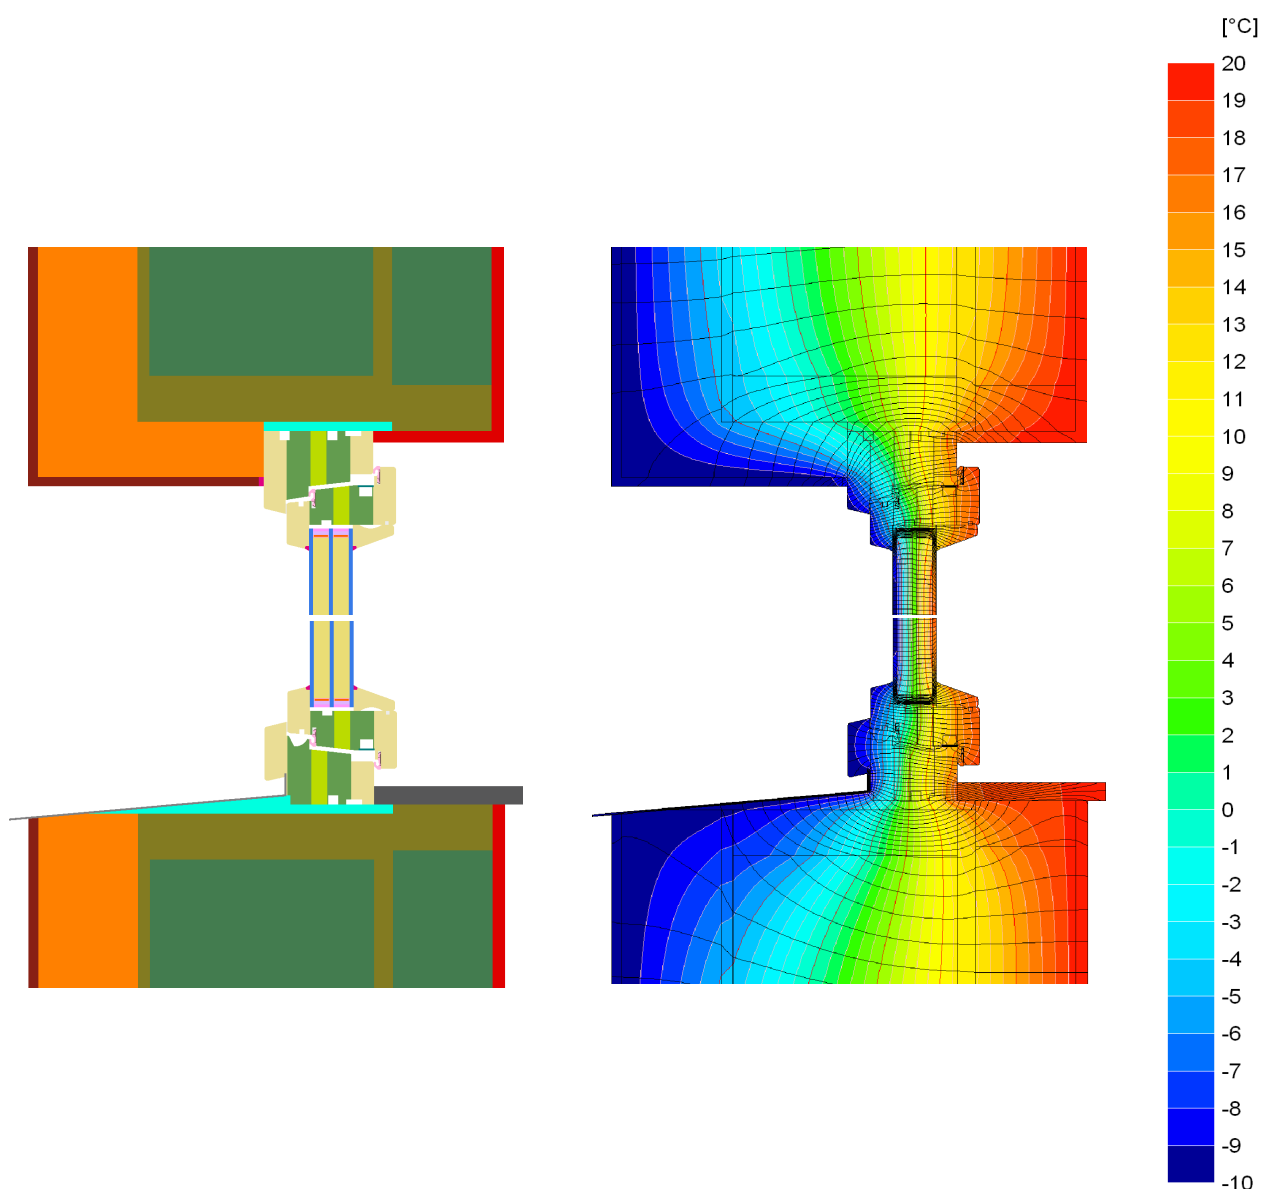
Installation 'bottom' und 'side/top' in a Timber construction wall with respective isothermal graphic
